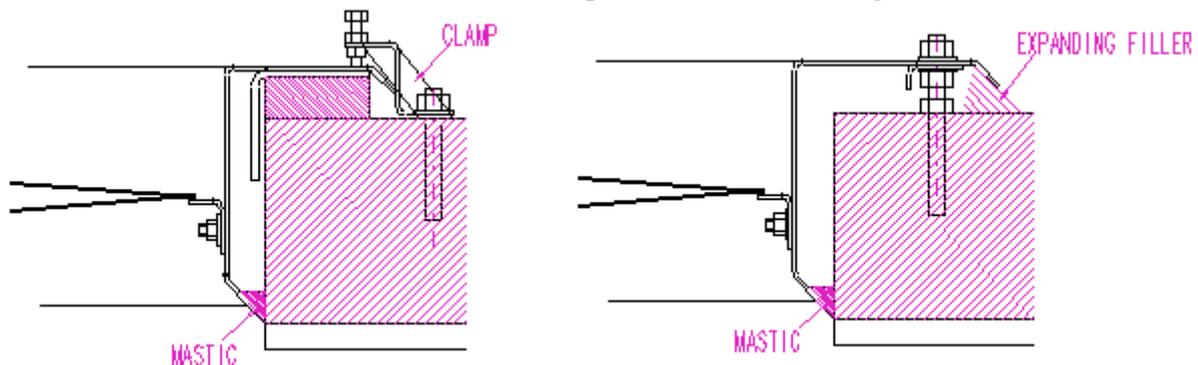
Recessed Damper Installation with (left) and without (right) a Concrete Plinth and Installation Frame
